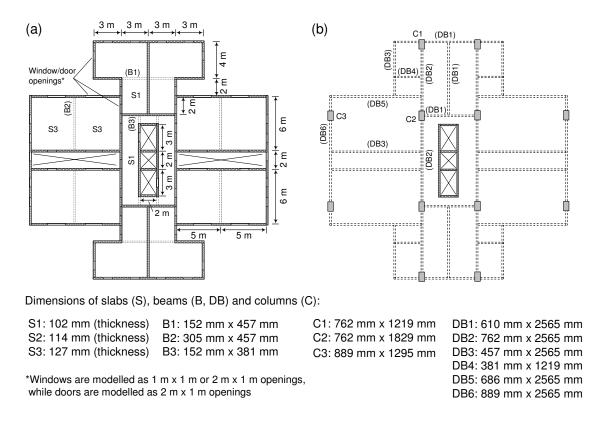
Superstructure layout for hypothetical building: (a) typical floor; (b) atrium floor. Building is symmetrical in two directions
